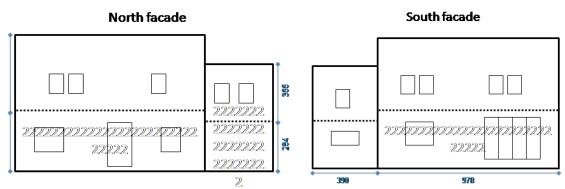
Facade view of North (left side) and South (right side) elevation of the single-family house
